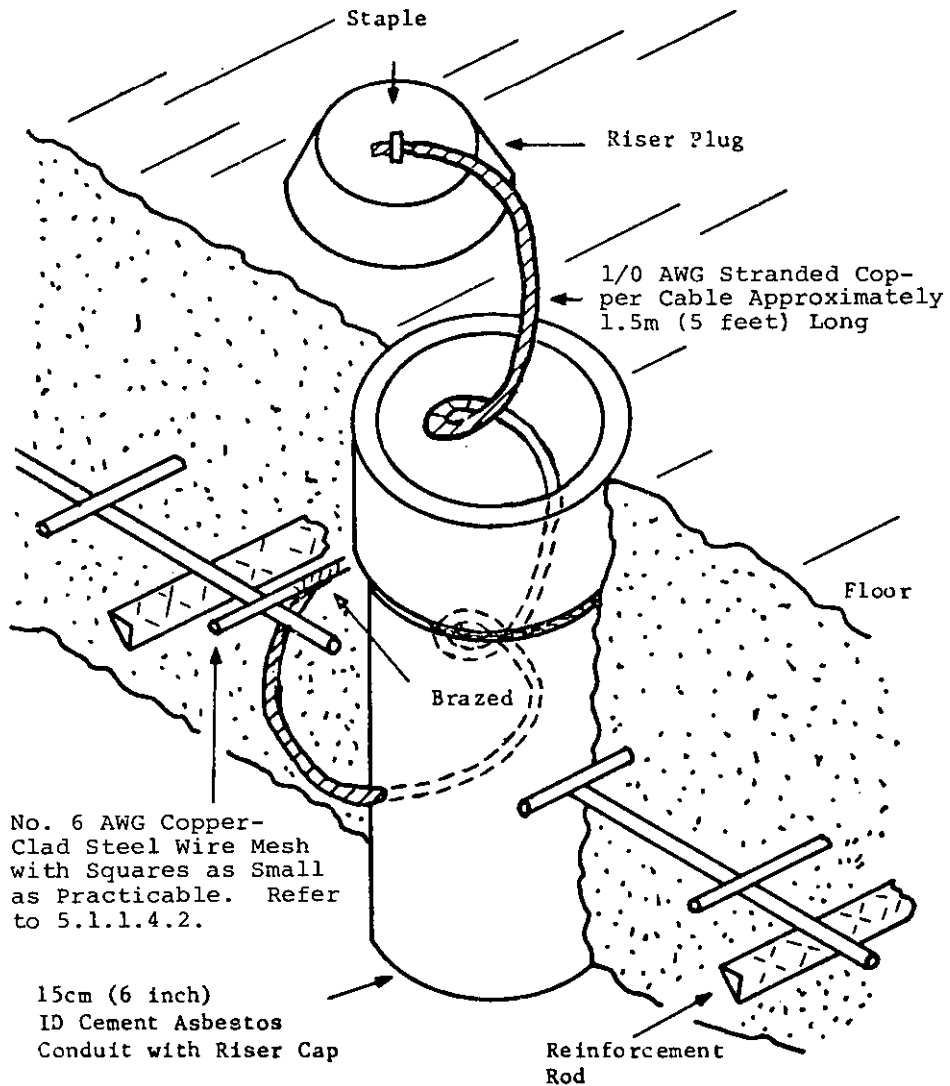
Typical Equipotential Ground Plane for Higher Frequency Facilities Installation (New Construction)
